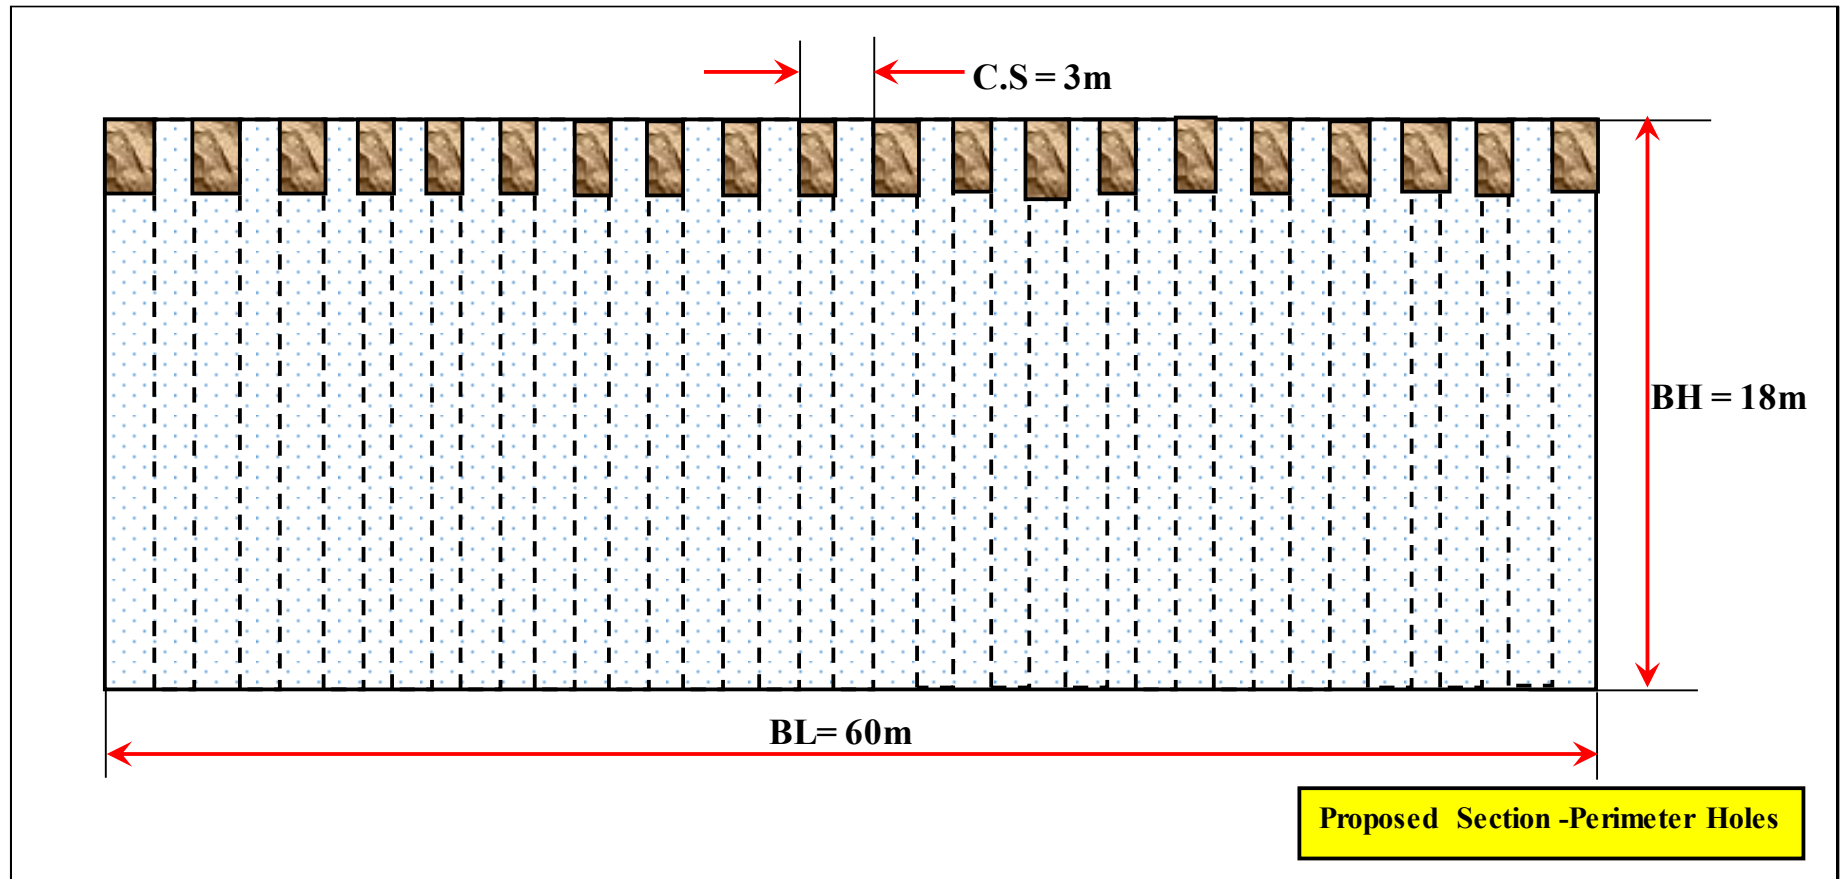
Proposed Section Perimeter Holes (author's illustration)
